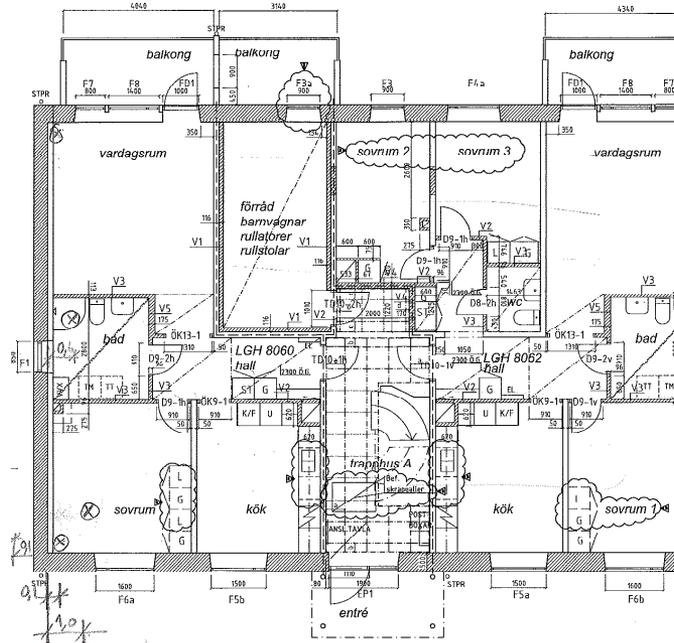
Placement of temperature meters in ground floor construction (Drawing: Skanska).
